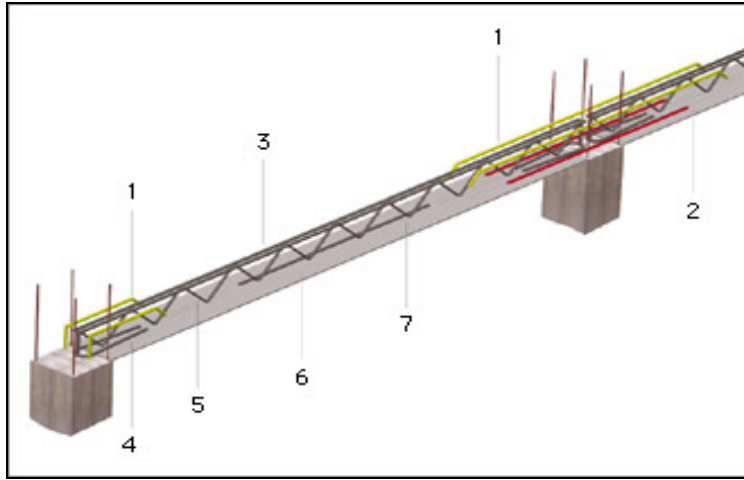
Solution by means of reinforcing bar pieces: (1) reinforcing bar pieces; (2) e (6) steel plate as truss bottom chord; (3) steel bars as truss top chord; (4) additional bars near the support; (5) diagonal curved bars as vertical truss web; (7) additional bars across the middle span
